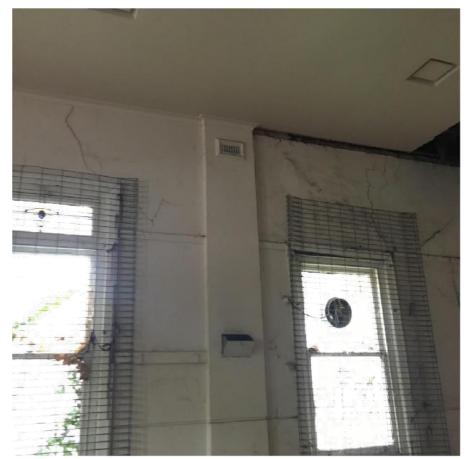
North Wall looking internally both previous photos 6 & 7 are the same cracks viewed externally.
